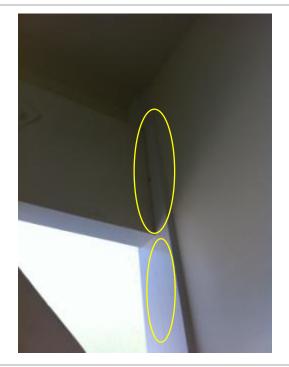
Cracking Present to Window Architrave in SE corner of South Stair
